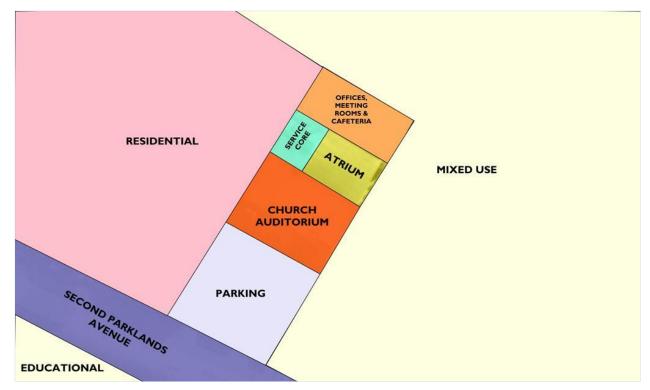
CITAM Parklands – Site Layout & Adjacent zones.
